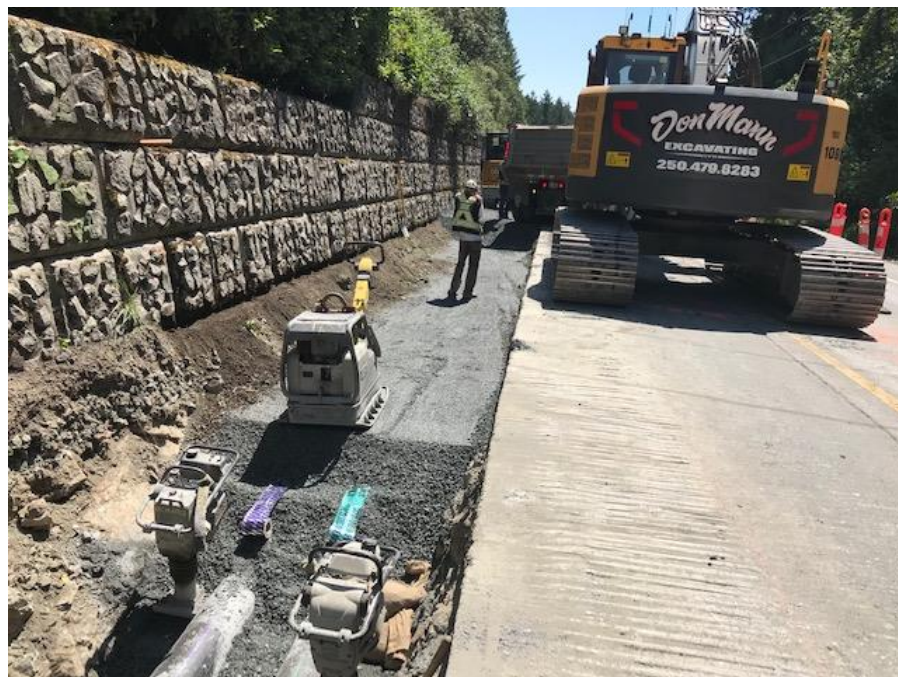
RSCL100: - Minimum 150mm of pipe bedding placed in rock removal area on Interurban Road.
